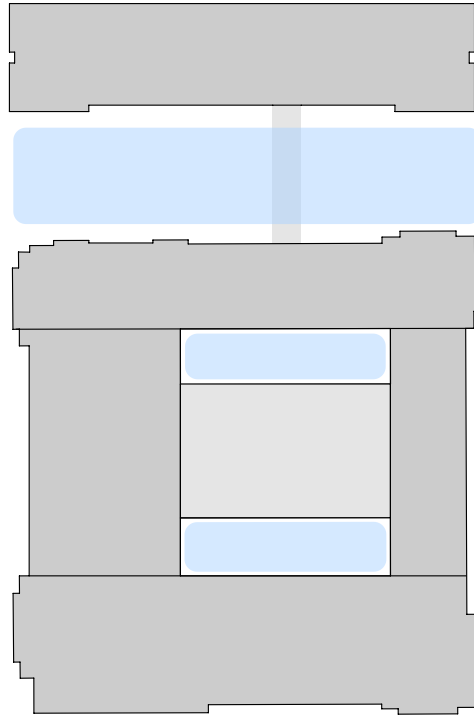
Diagram illustrating how the new building is conceptually a new wing of Parliament House
